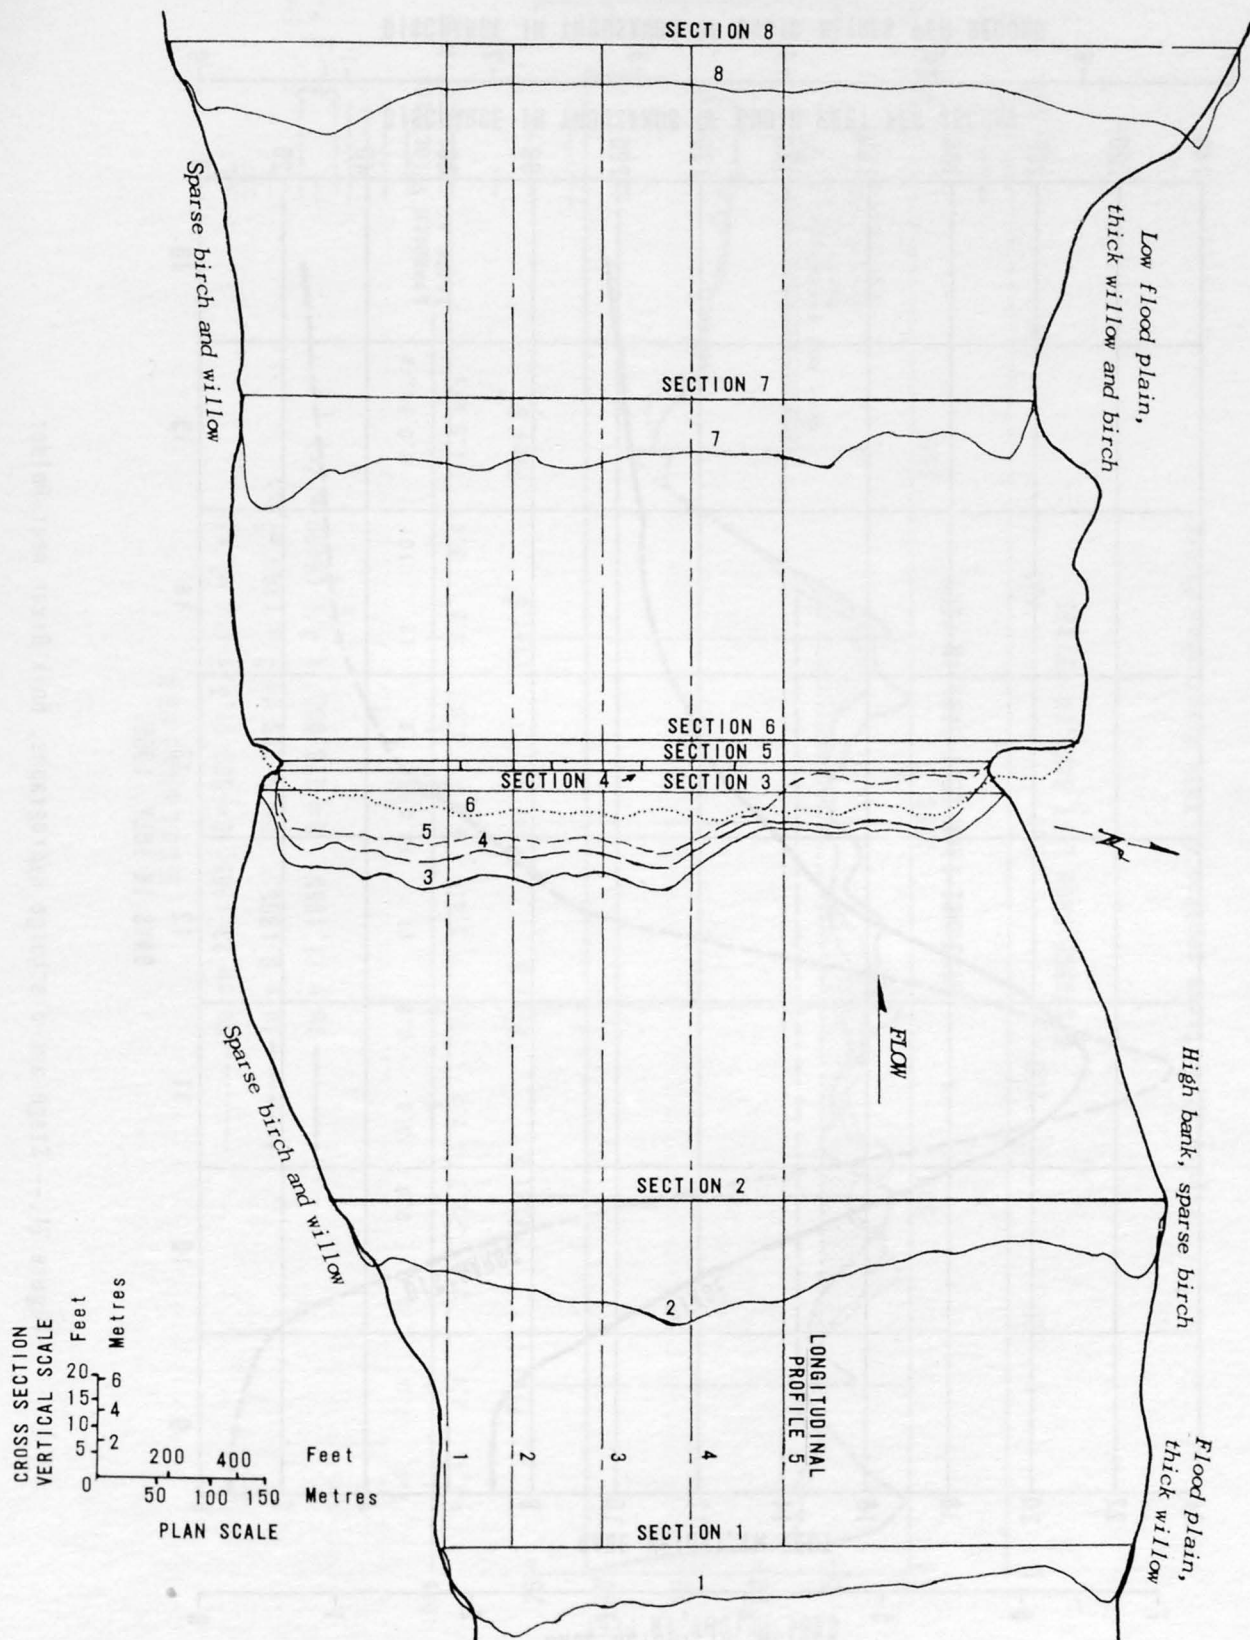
Location and general shape of cross sections, Knik River near Palmer at bridge 539.
